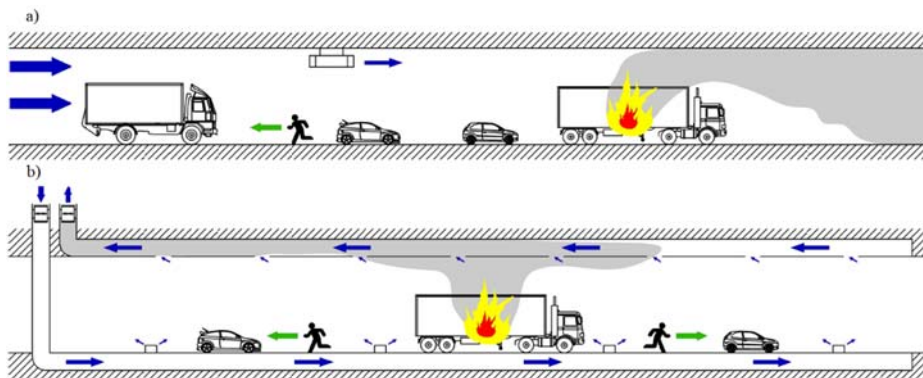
Ventilation of the road tunnels (a) longitudinal system (b) transverse ventilation
